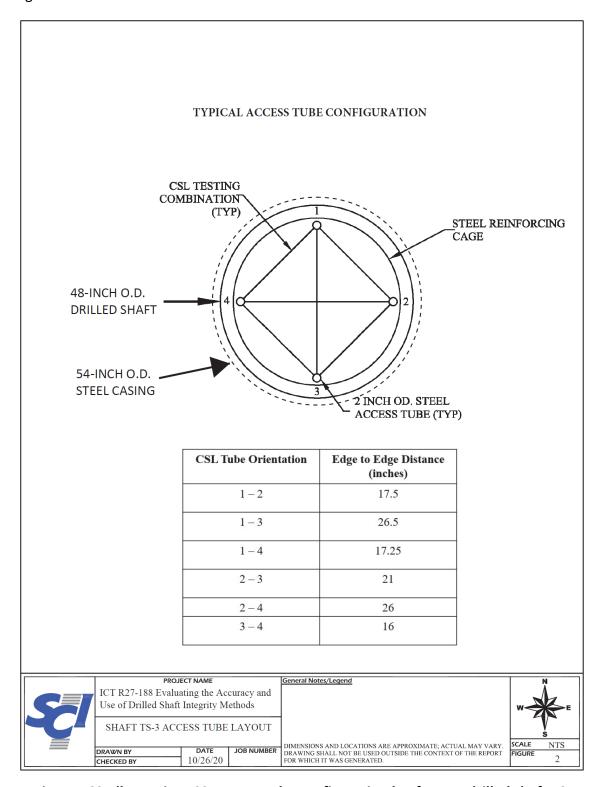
Illustration. CSL access tube configuration log for test drilled shaft #3.
